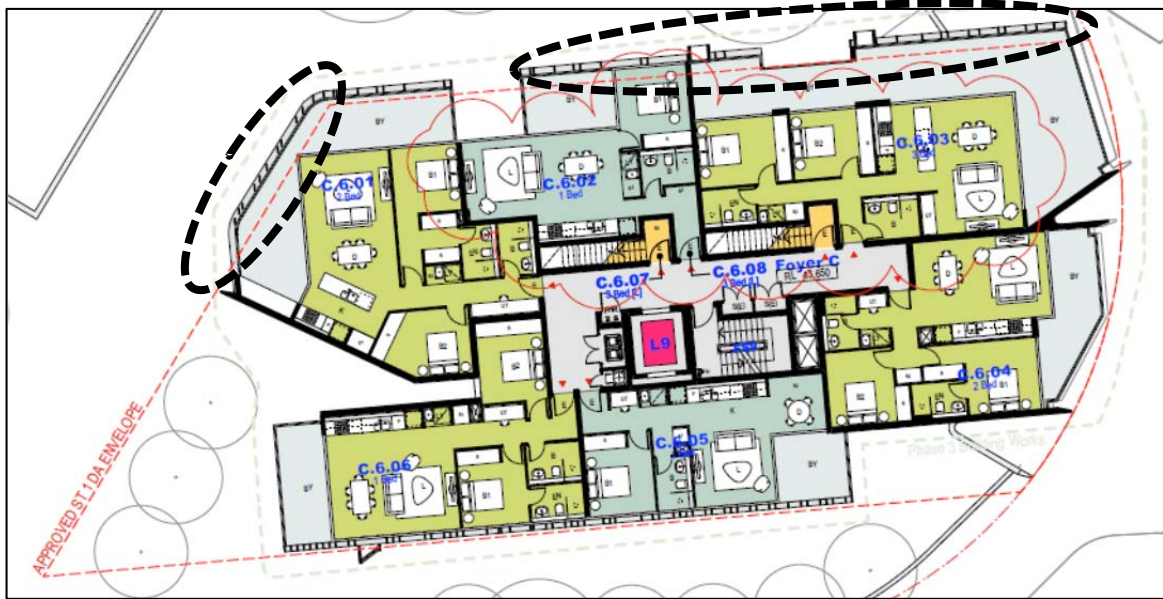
Balcony elements and facade detail of Building C outside the approved envelope
